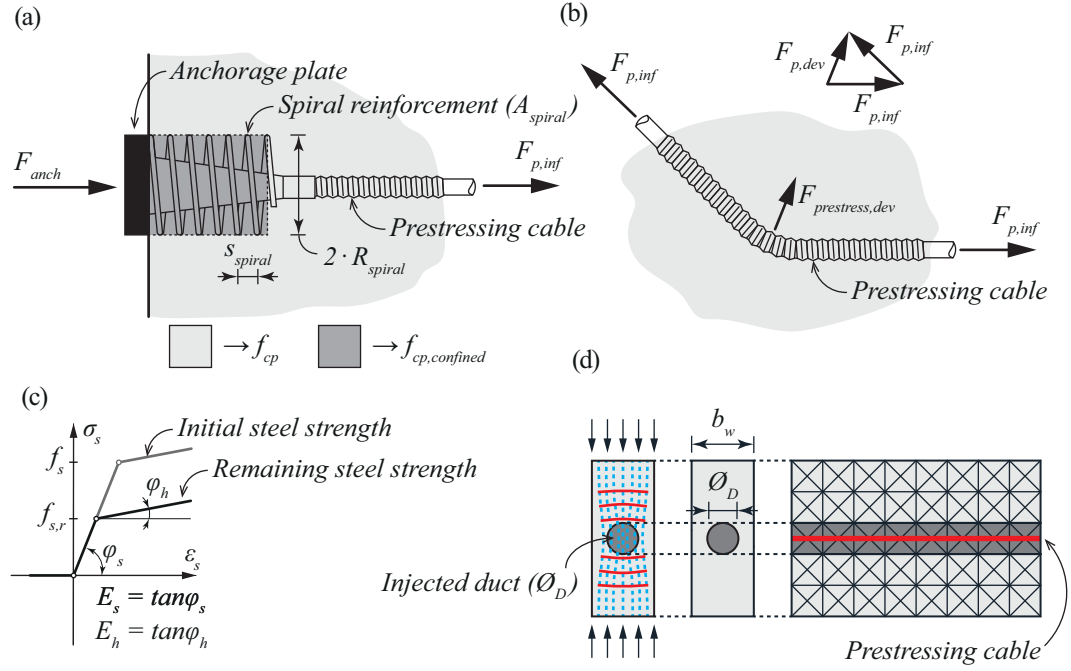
Modelling the effects of prestressing in JCONC – anchorage of the prestressing cables (a); introduction of deviation forces (b); constitutive law of prestressing steel (c); modelling of the prestressing duct (d)
